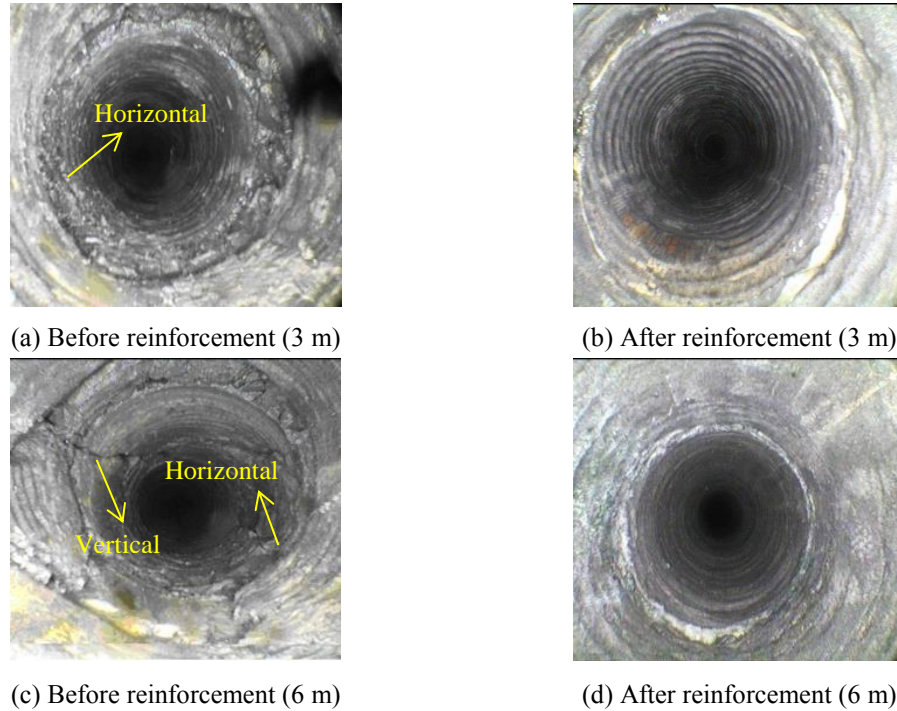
Integrity of the roof strata before and after the installation of hollow grouting cable
